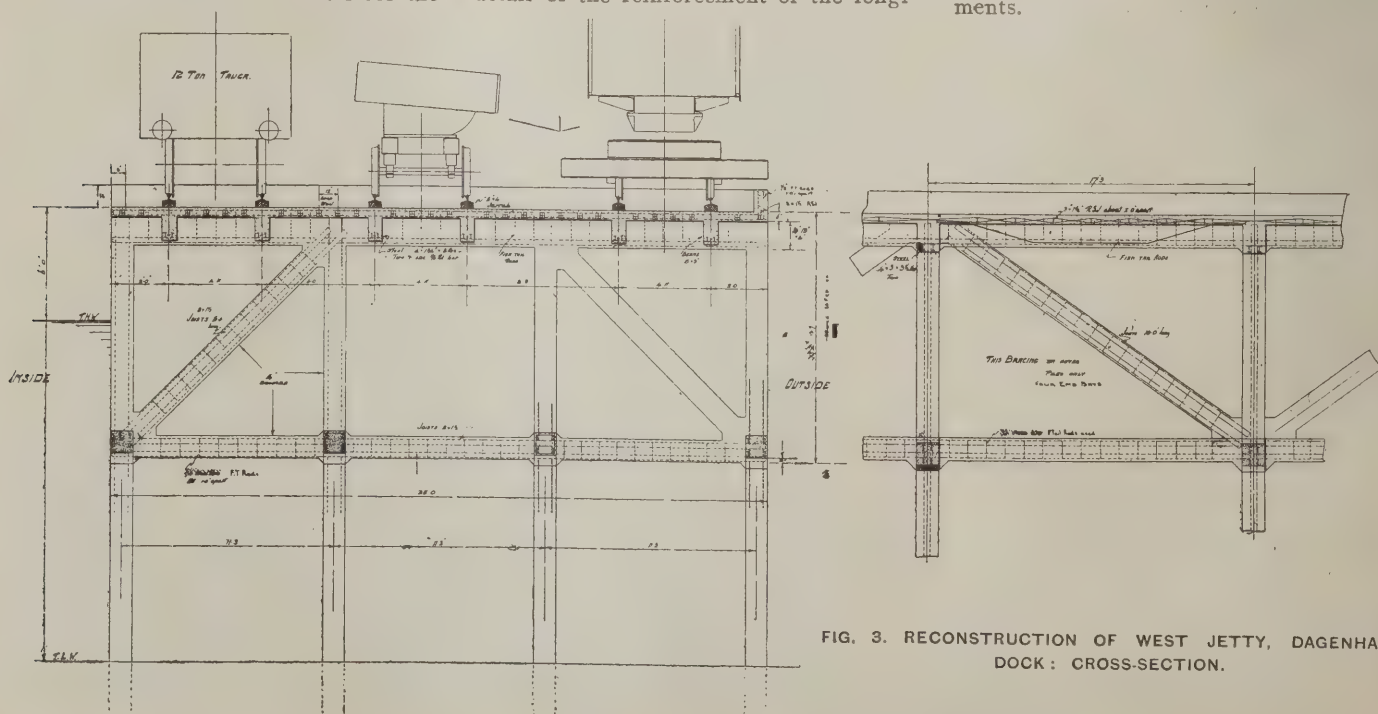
RECONSTRUCTION OF WEST JETTY, DAGENHAM DOCK: CROSS-SECTION.
